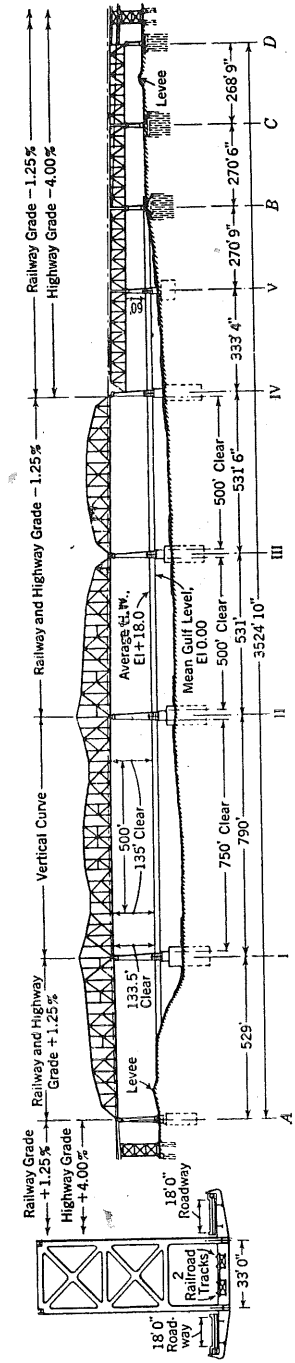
GENERAL DIMENSIONS OF BRIDGE FOR THE FOUNDATIONS OF WHICH THE SAND-ISLAND METHOD SHOWN IN FIG. 123 WAS USED.
